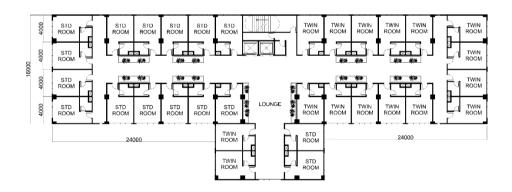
2nd – 4th Floor Plan Source: (Author, 2022)
